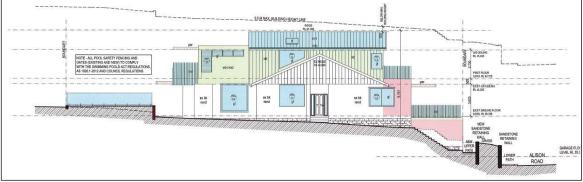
Proposed West (Side) Elevation (Urban Moose)
